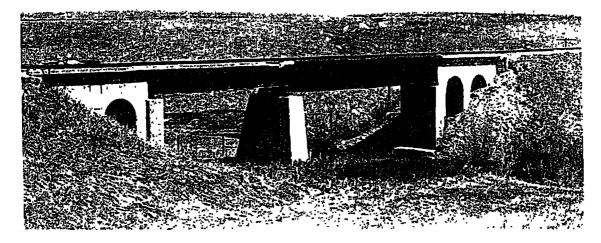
This deck girder bridge on the Milwaukee Road west of Aberdeen displays the arched concrete approaches that were characteristic of that railroad's larger bridges (State Historic Preservation Office photo).
